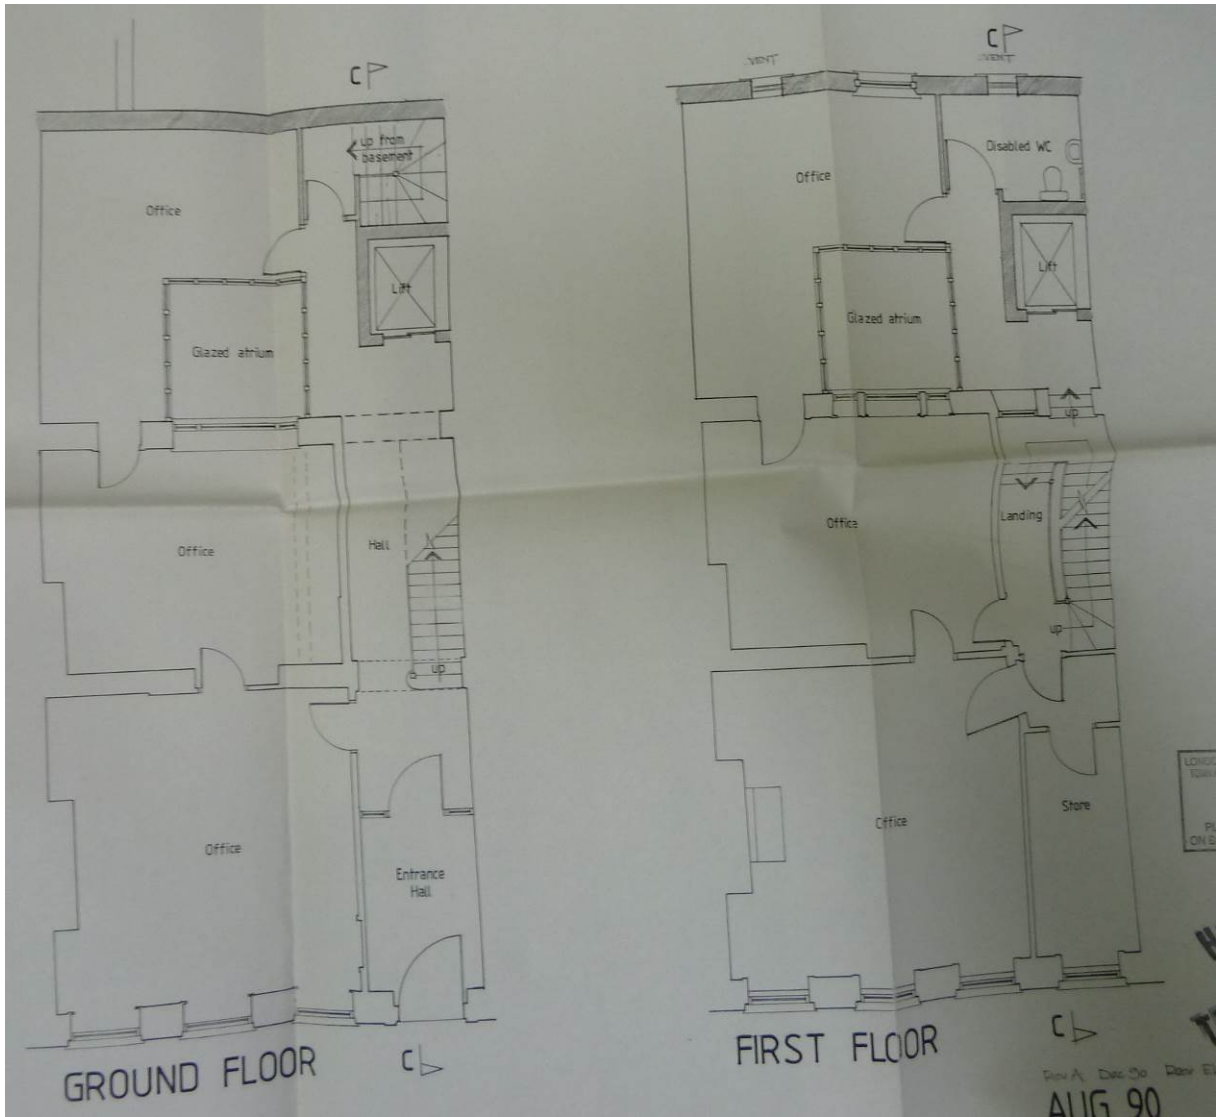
Proposed ground and first floor plans, 1990, Gerald Steer (LB Camden, planning file)
